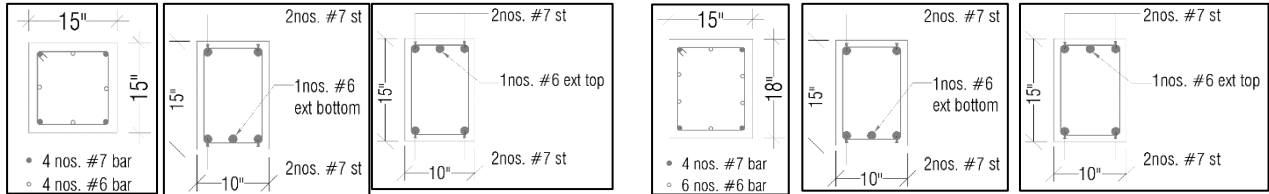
Studied Corner (first 3) and interior (second 3) Beam-Column dimension and reinforcement details.
